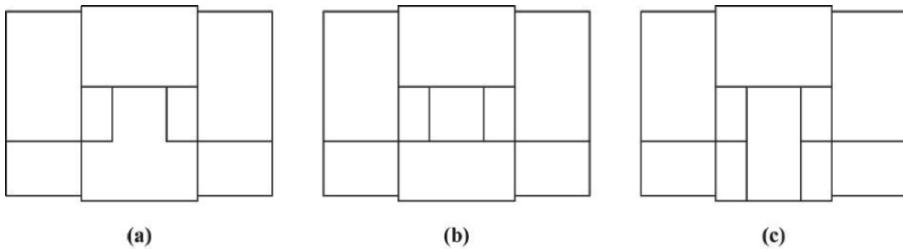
A floor plan in the Palladian style (Stiny and Mitchell)
